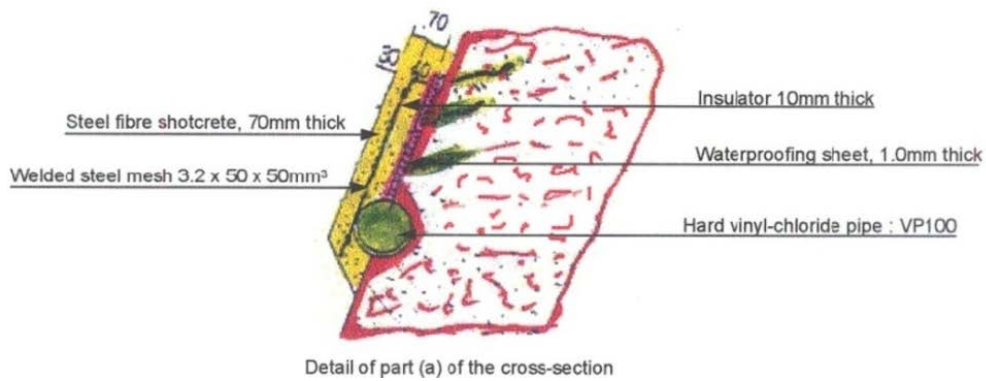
Collecting leakage water via a waterproofing sheet, a vinyl-chloride pipe, and covering with a protective layer of reinforced steel-mesh shotcrete (Russell, 2001).
